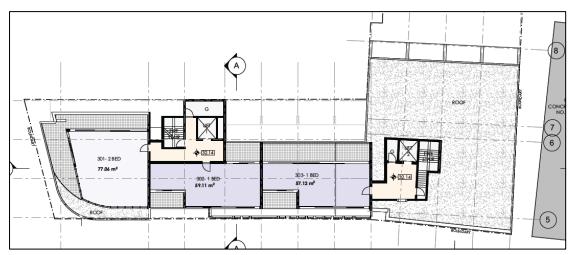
Proposed Level 3 plan. (Source: PTI Architecture Pty Ltd)
